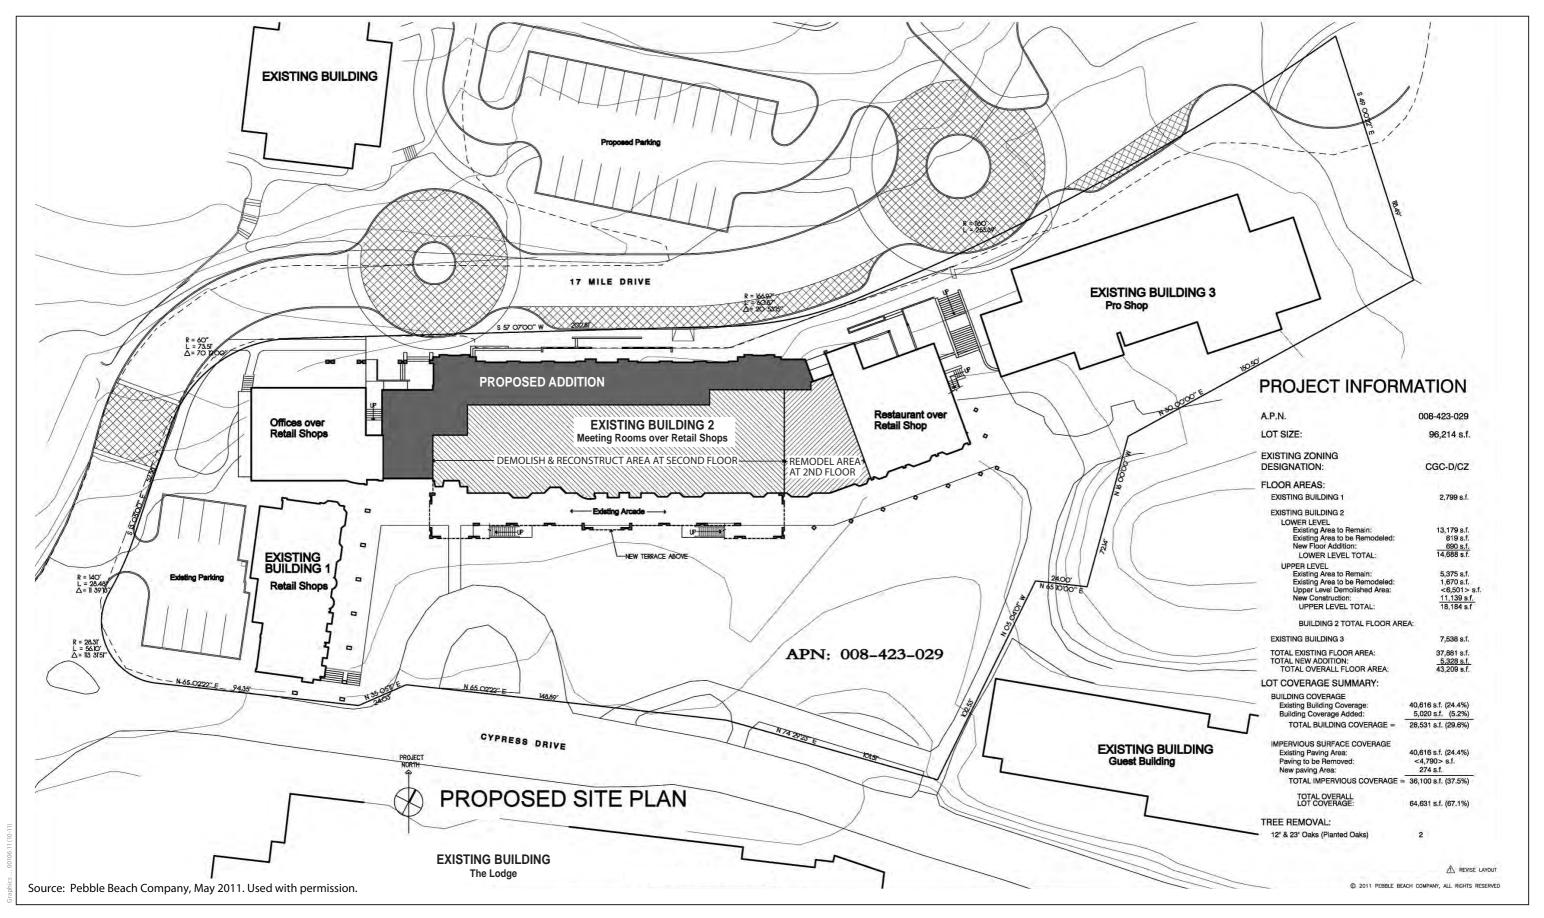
Meeting Facility Expansion at The Lodge at Pebble Beach
